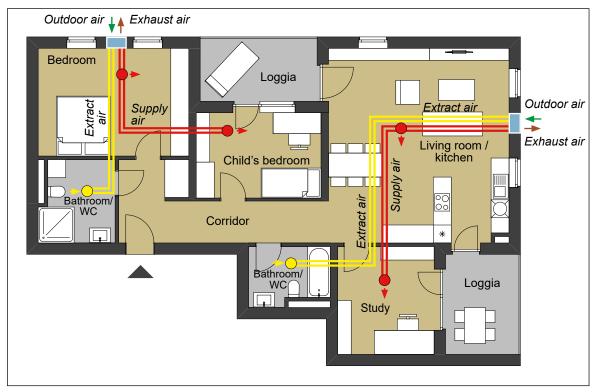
Ventilation of a 4-room apartment using a flexible pipe system
